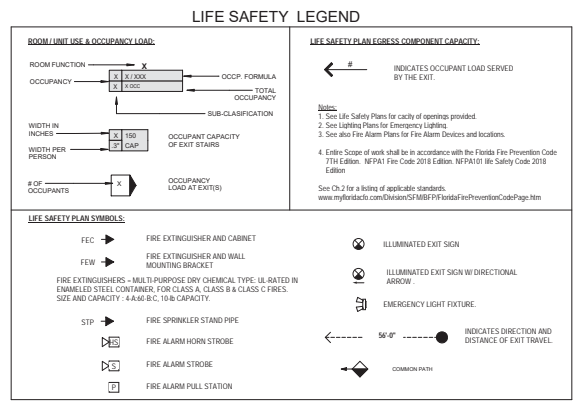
EXHIBIT A - Lowdermilk Facility Improvement Drawings S & S
